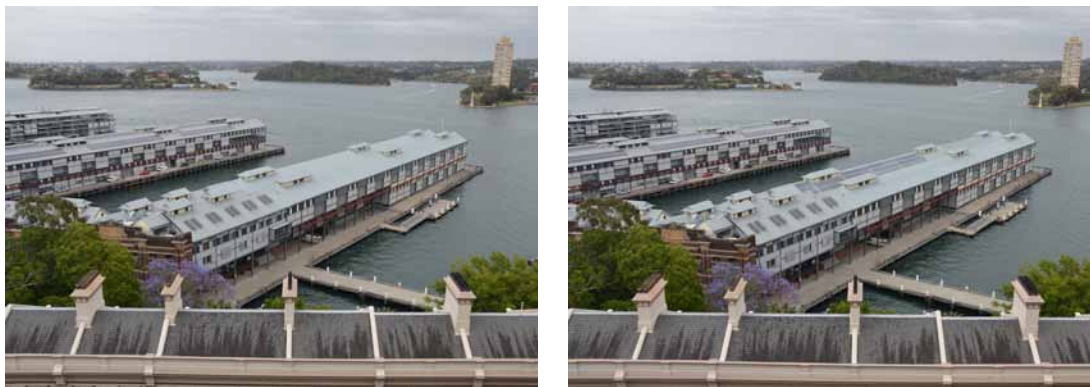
Existing photo of Pier 2/3 (left) and photomontage (right) showing the likely appearance of raised roof for ACO auditorium and solar array on Pier 2/3. Image taken from the Harbour Bridge, bicycle path
